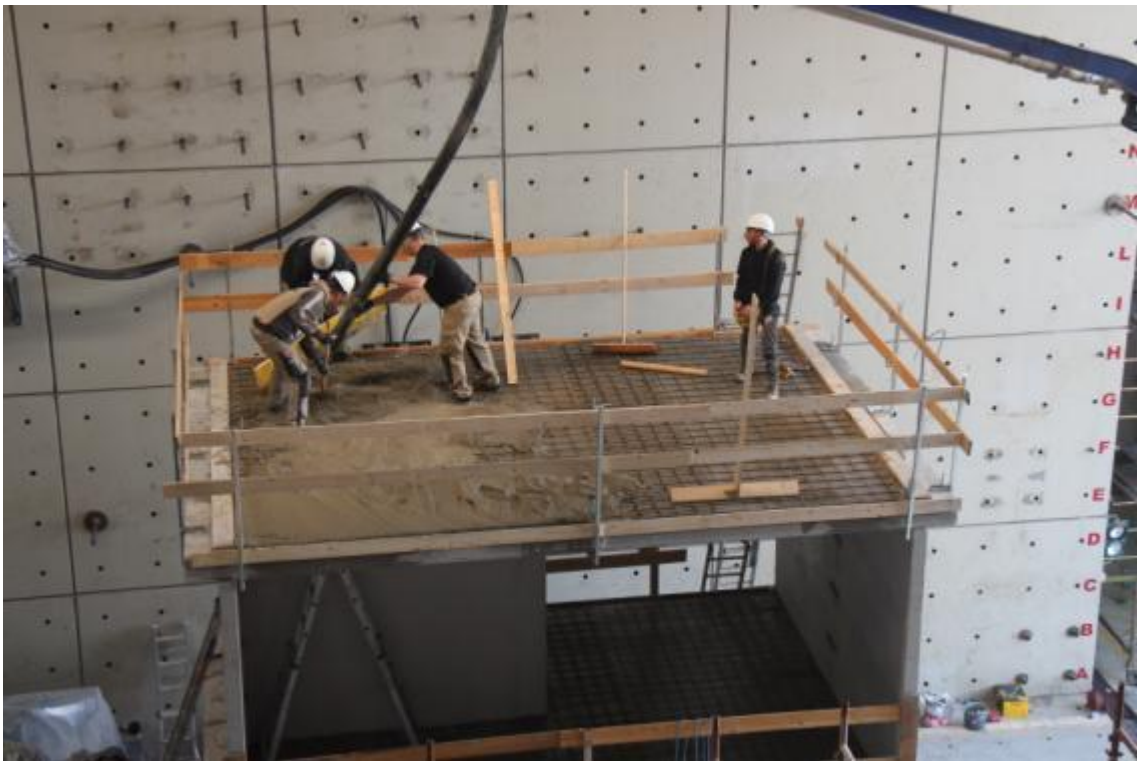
Casting of concrete slab topping – second storey, detail 3.
